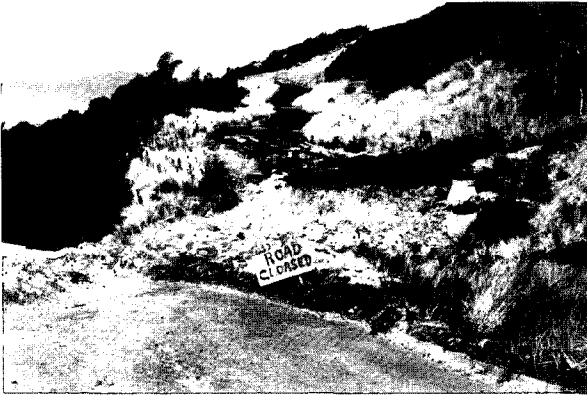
The destruction of streets and sewers by landsliding within a new development north of Yaquina Head.
